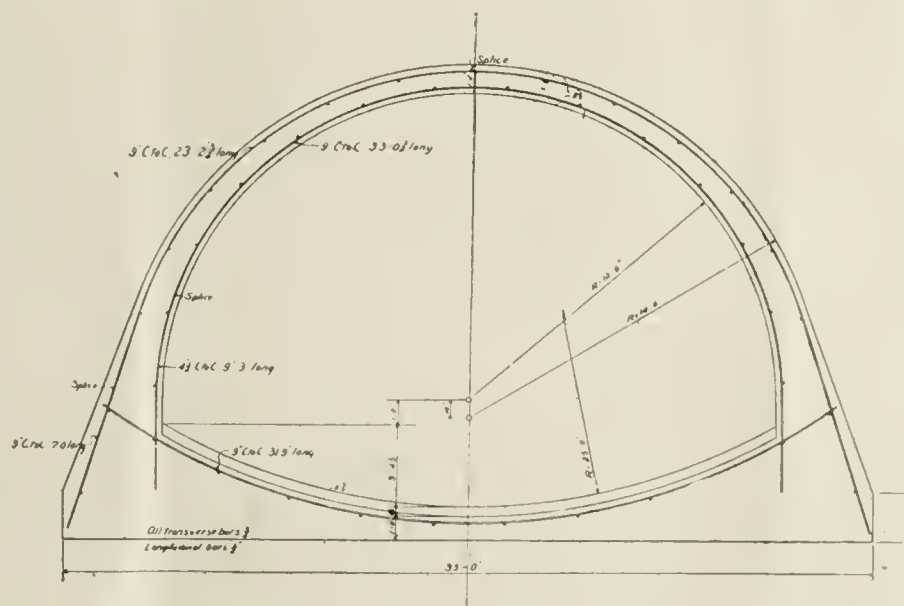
Section of sewer 25 ft. clear span, 29 ft. over all.
